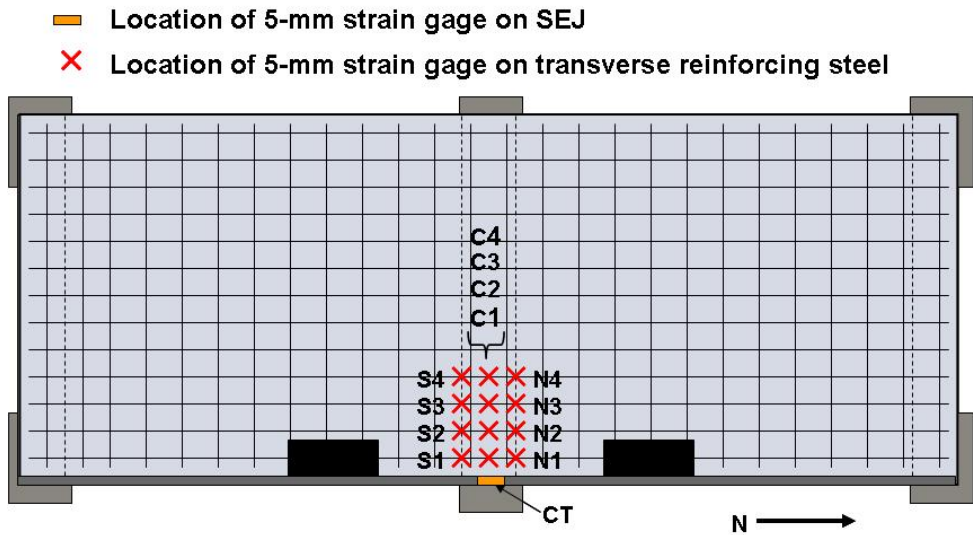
Layout of Strain Gages for Specimen N0P1
